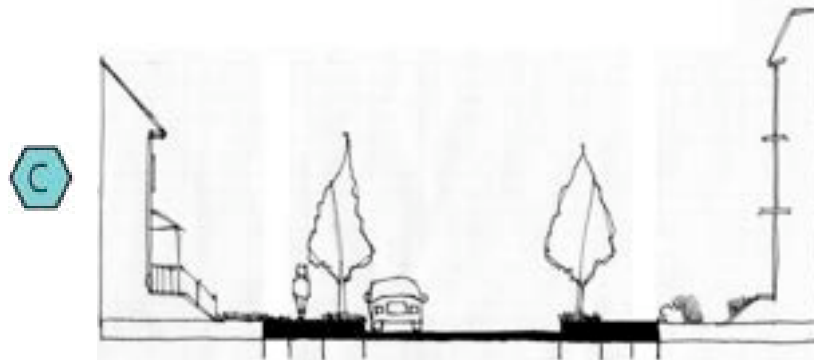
Residential Street: 4 ft utility easement, 4 ft sidewalks, 5 ft sidewalk medians, 1 row of parking and two lanes of traffic. 50 ft total.
